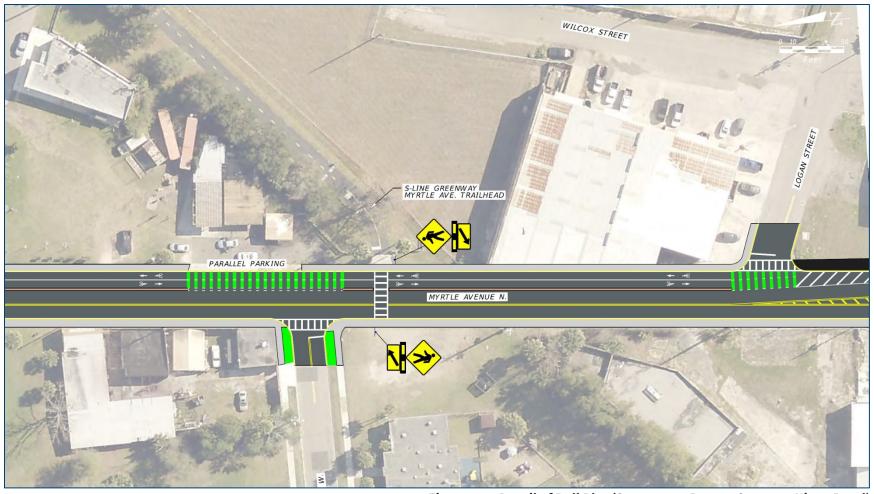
Detail of Roll Plot (Segment 2, Beaver Street to Kings Road)
